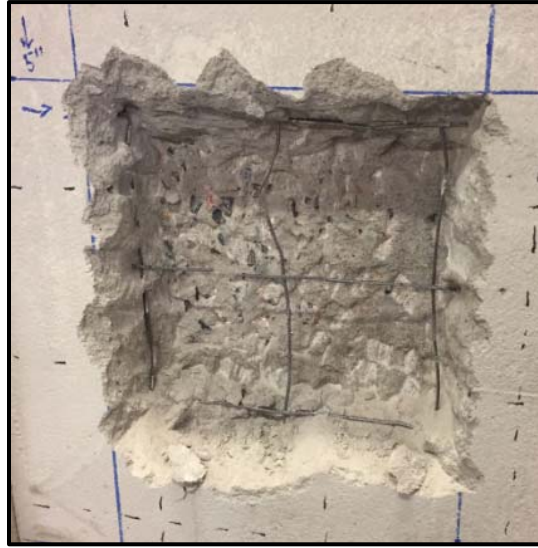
Example of inconsistent kerf and damage to steel infrastructure during impact hammer testing.
